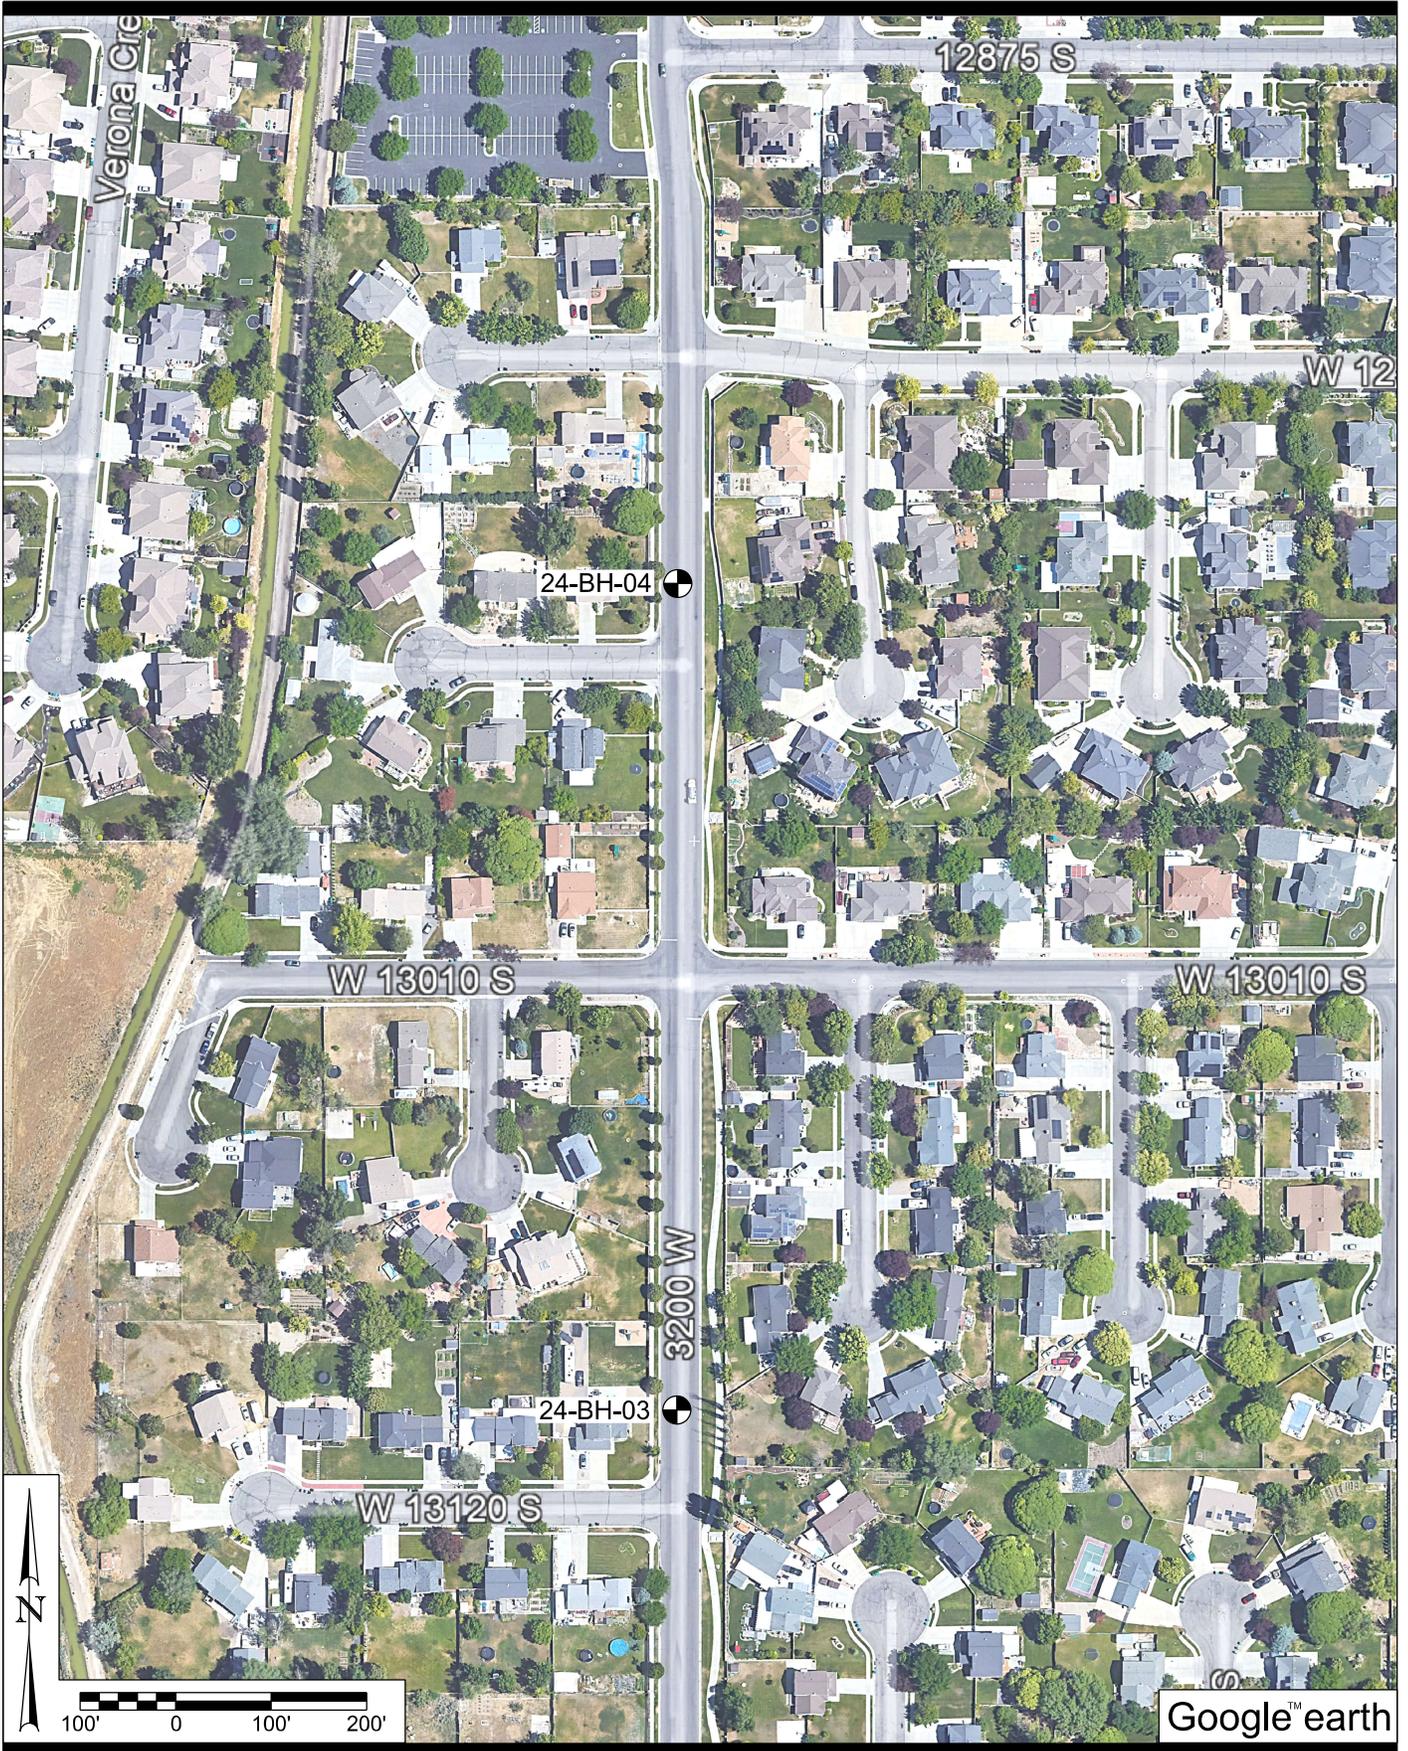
SITE PLAN & TEST HOLE LOCATIONS
